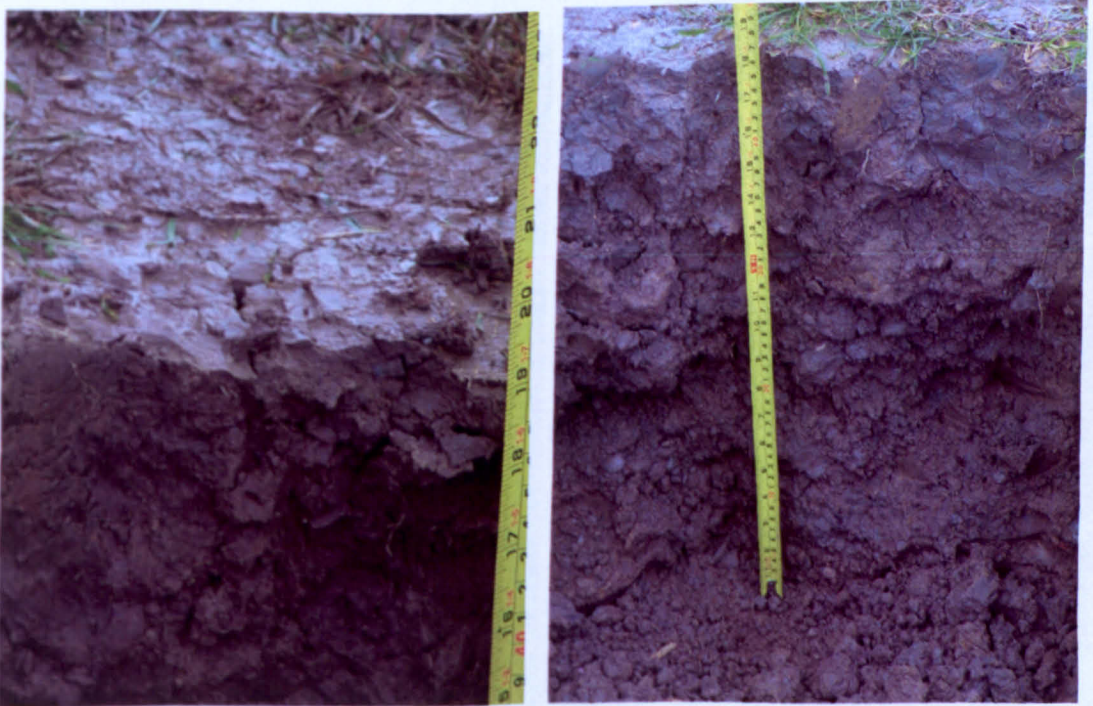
Observed cracks in trench excavated along the new embankment.
